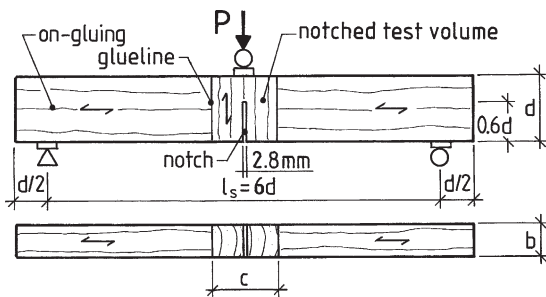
Specimen geometry and test scheme of single-edge notched beam (SENB) specimen used in the Mode I size effect study.
